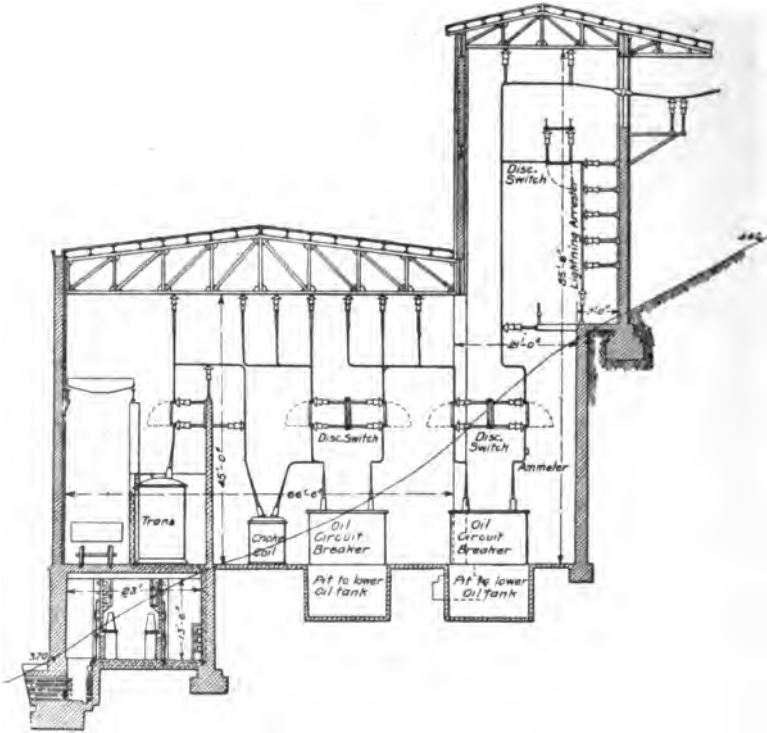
100,000-Volt Station: Cross Section Through Switch House.
